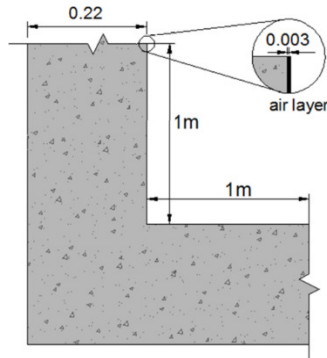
Wall geometry used in the numerical applications – concrete wall without thermal insulation (dimensions in m).
